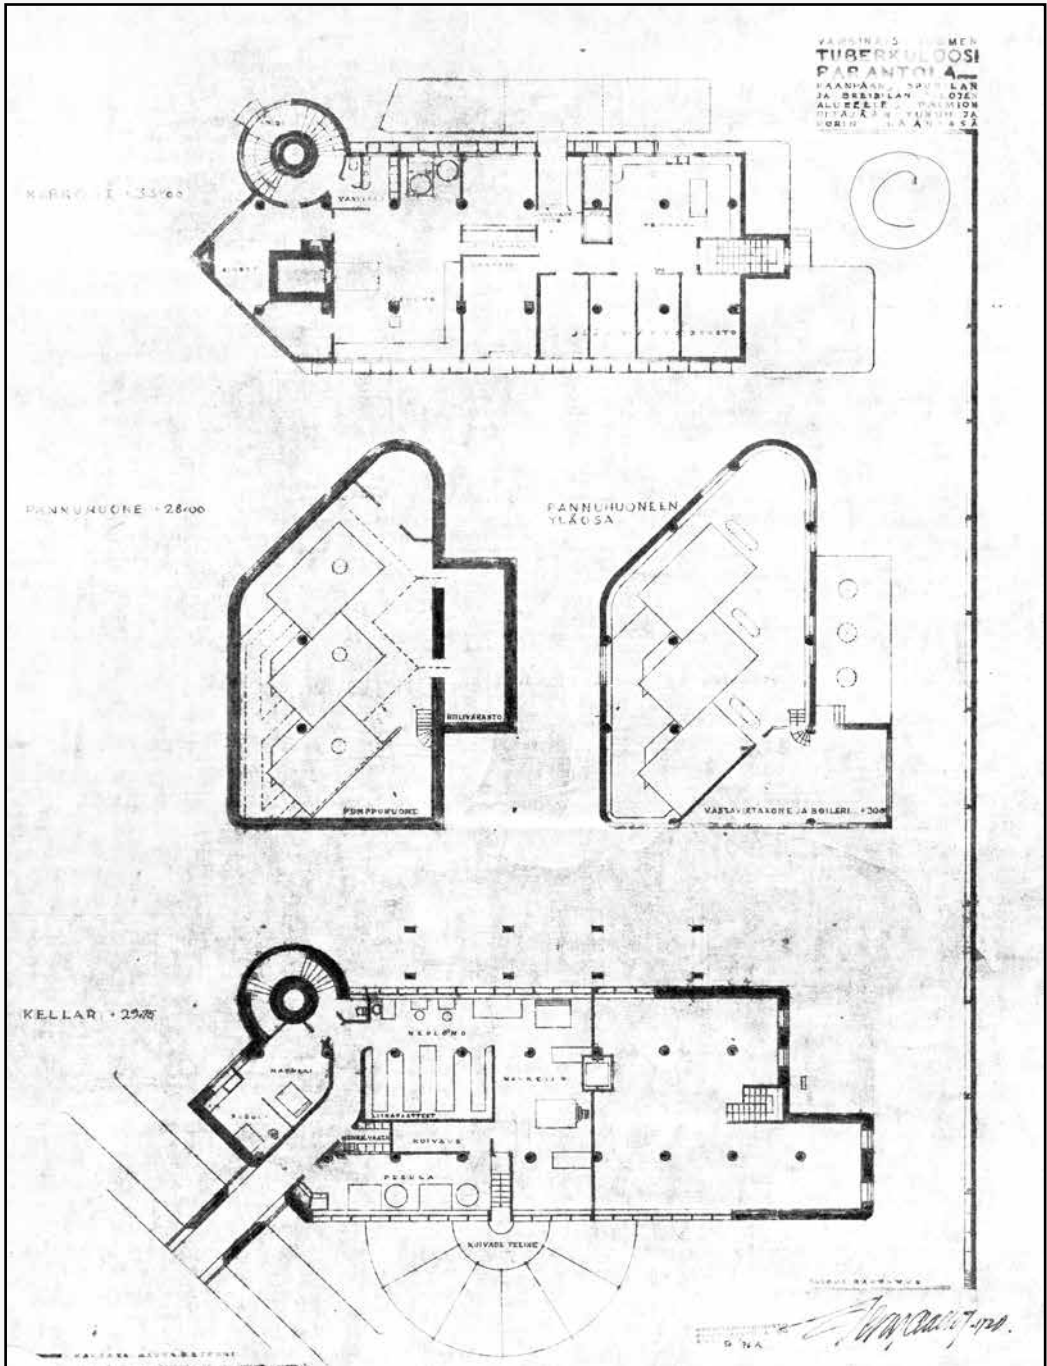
Master drawing of two plans of the C wing, and plans of the D wing, the district heating plant, in the middle, April 1930. Drawing No. 50-76a. The drawing has been edited. AAM.
